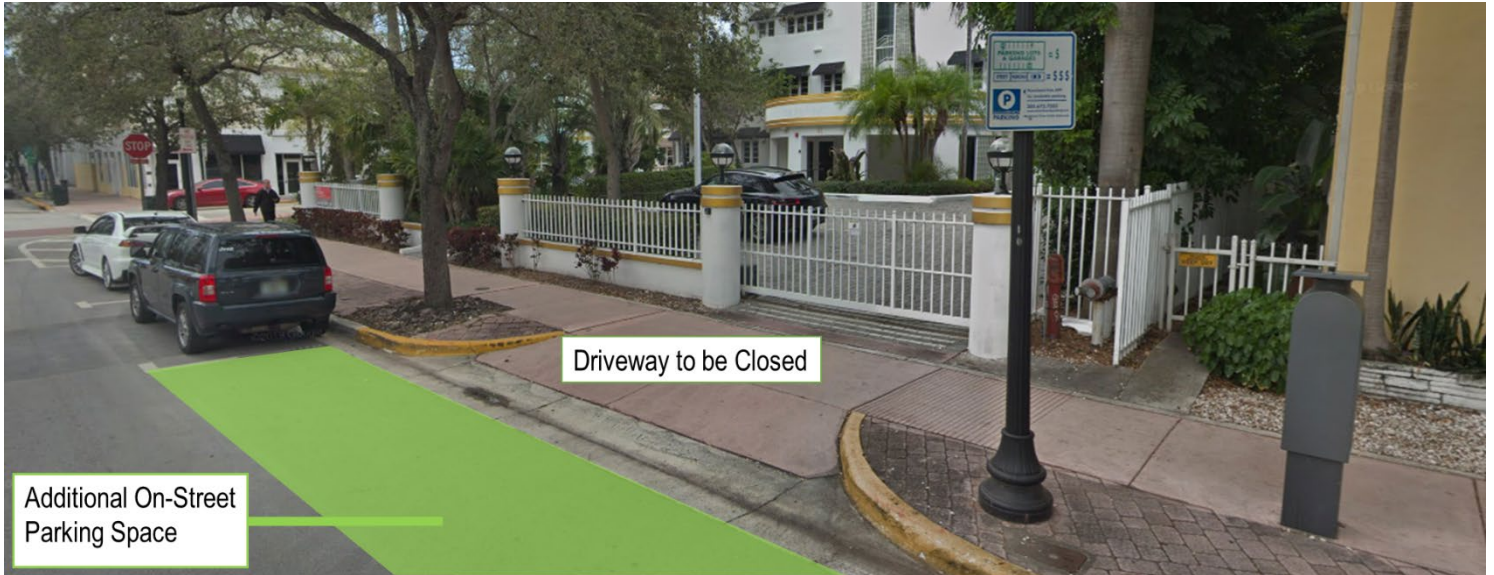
Site Photograph Looking Westwards the intersection of Washington Ave. and 1st St.
